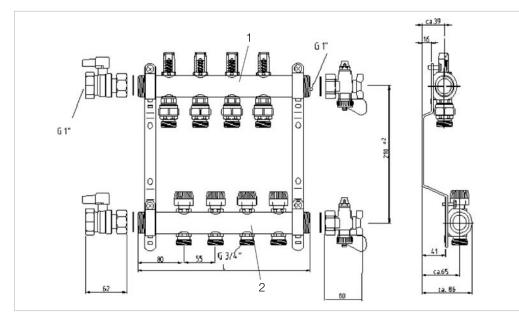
Connection dimensions of REHAU manifold HKV-D
